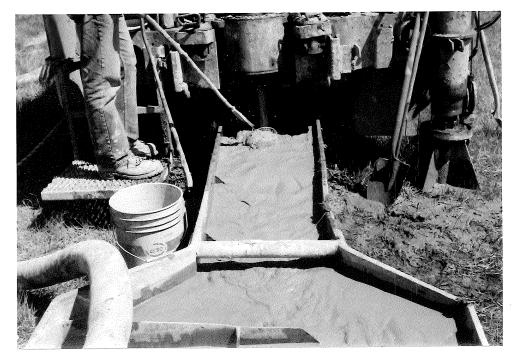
Test drilling. (A) Test drilling at Site No. 03 along SSEWS Canal.
